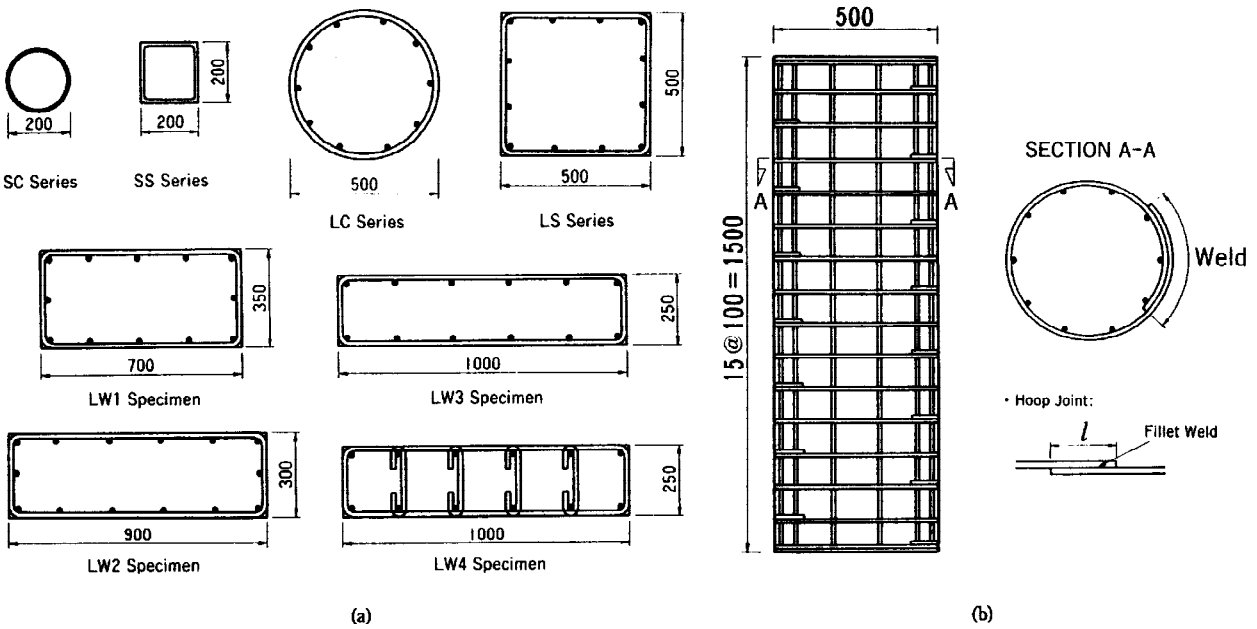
Construction details of specimens: (a) cross sections; (b) details for specimen LC3
